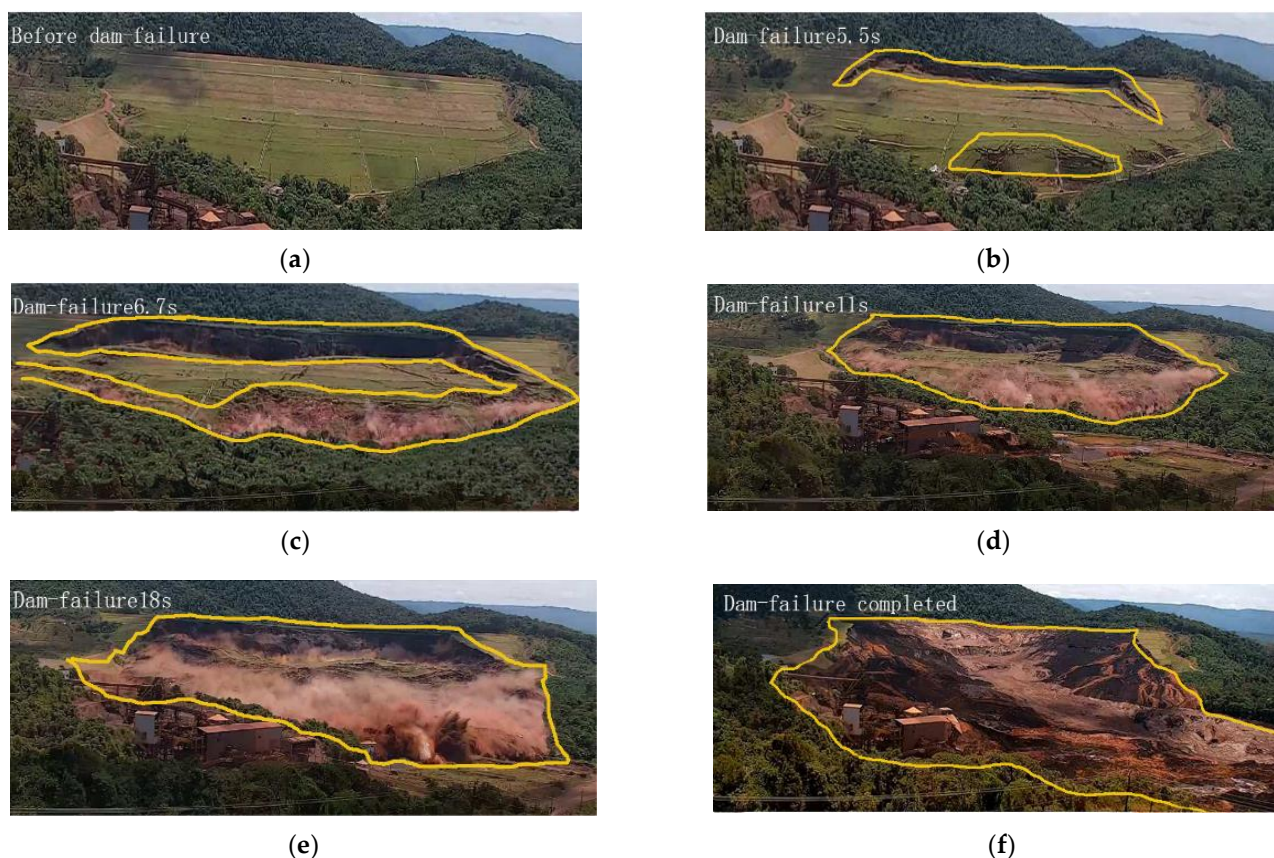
Feijó tailings pond dam failure, Brazil, 2019. (a) Before dam-failure; (b) Dam-failure 5.5s; (c) Dam-failure 6.7s; (d) Dam-failure 11s; (e) Dam-failure 18s; (f) Dam-failure completed.
